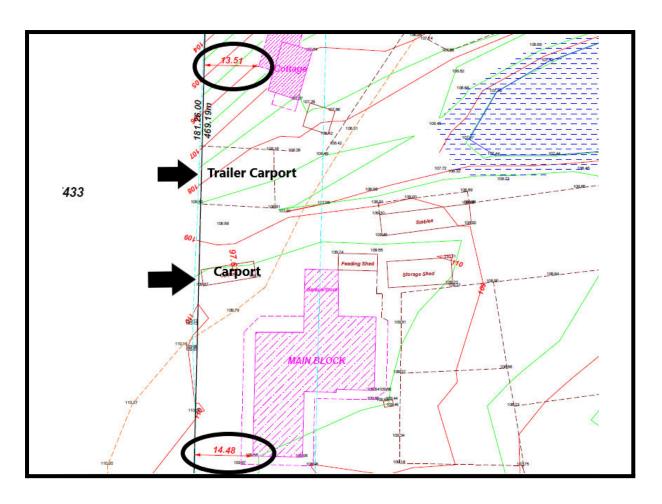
EXTRACT OF SITE DEVELOPMENT PLAN WITH DIMENSIONS
